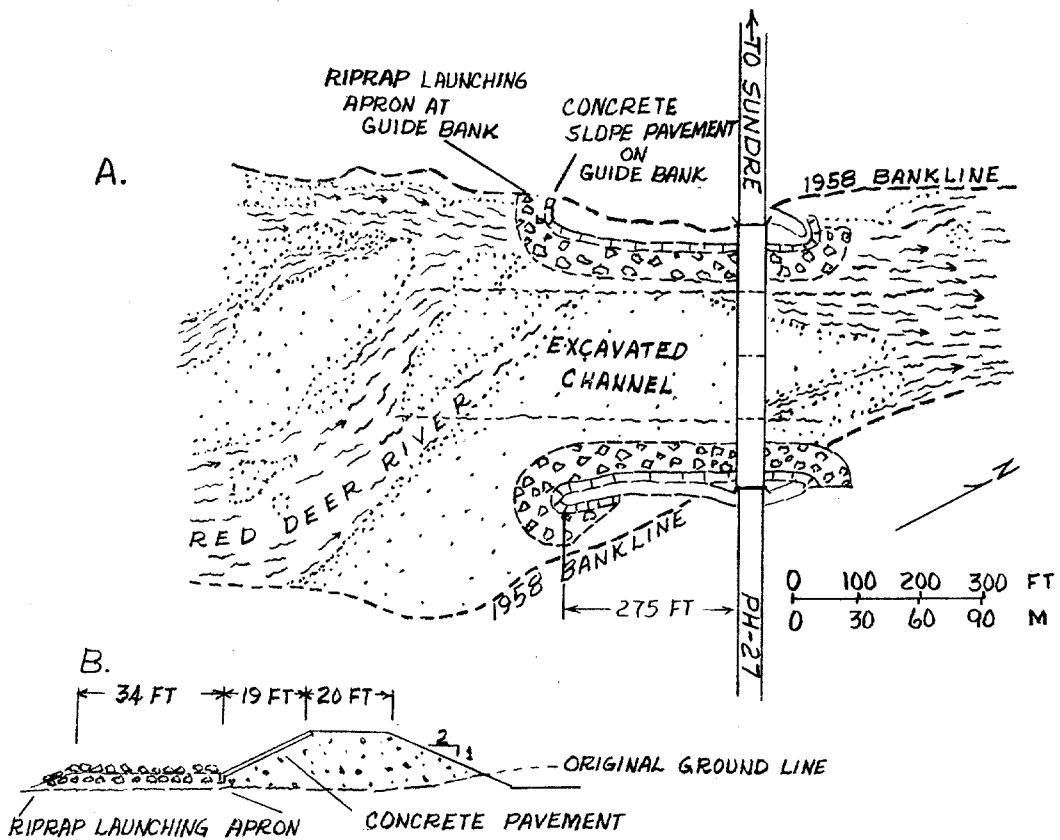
A, Plan sketch of training measures at PH-27 crossing, Red Deer River at Sundre. B, Cross section of guide bank.
